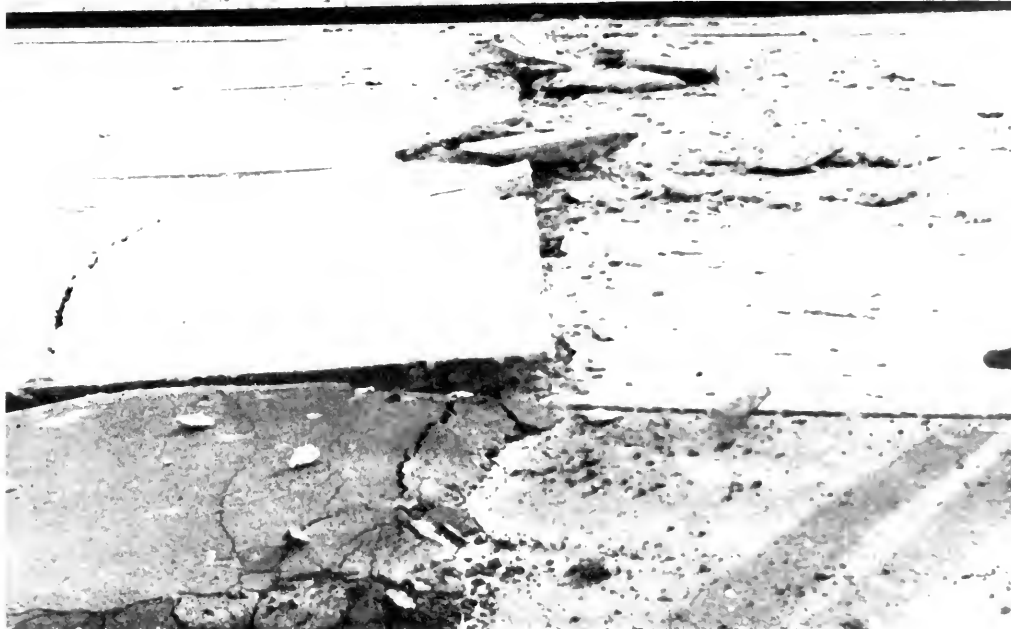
Spalling and overriding concrete pavement slabs on Route 210.
